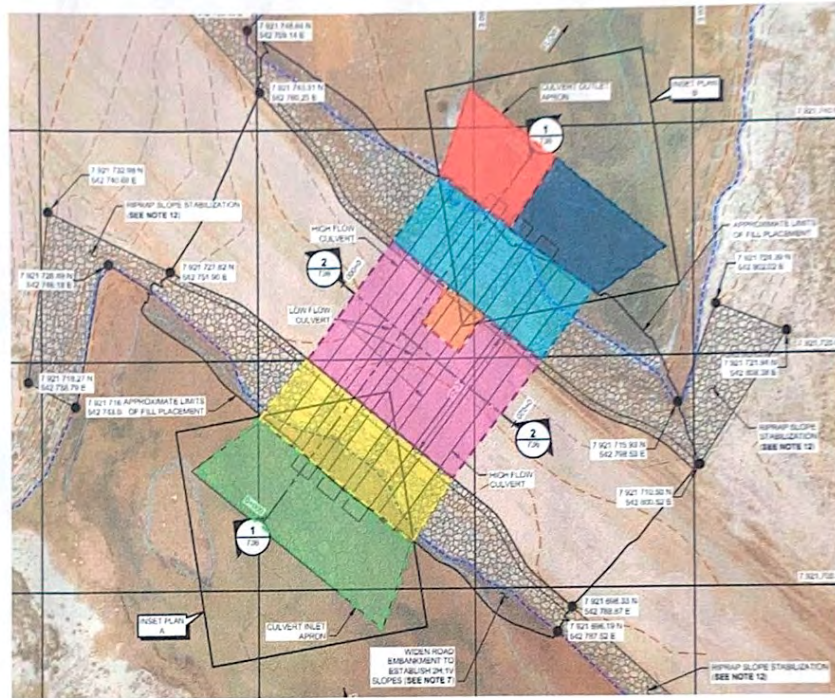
Approximate foundation acceptance area FND-01, plan view. Section 1 highlighted in green, Section 2 highlighted in yellow, Section 3 highlighted in purple, Section 4 highlighted in orange, Section 5 highlighted in light blue, Section 6 highlighted in red, Section 7 highlighted in navy.
